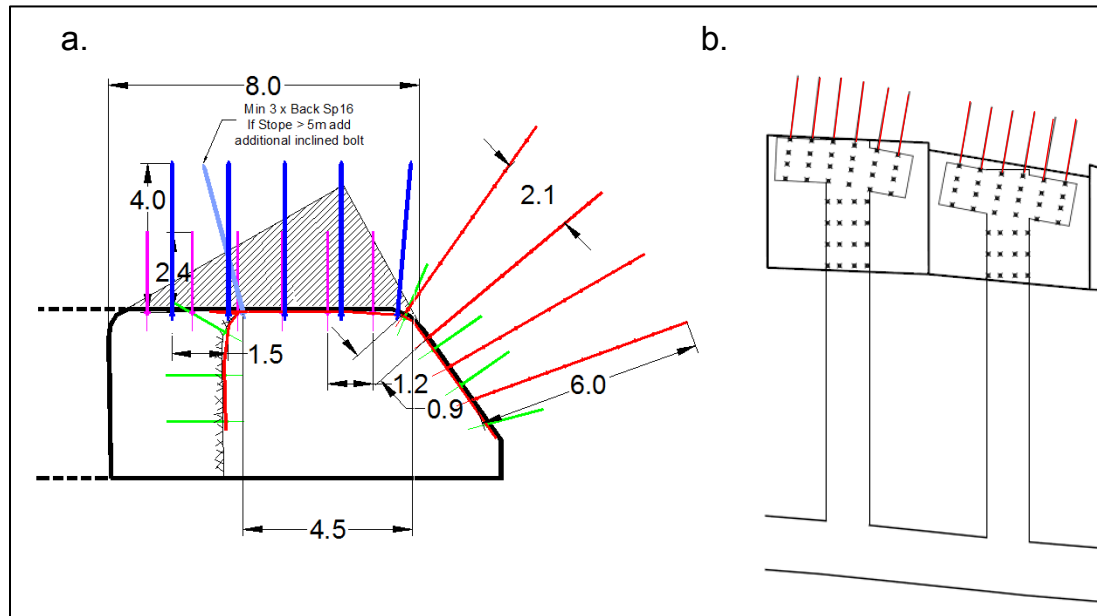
Typical SLS Back and Hanging Wall Support a) Cross Section through Typical Stope b) Plan View of Typical Stopes (prepared by Wood, dated 2021)
